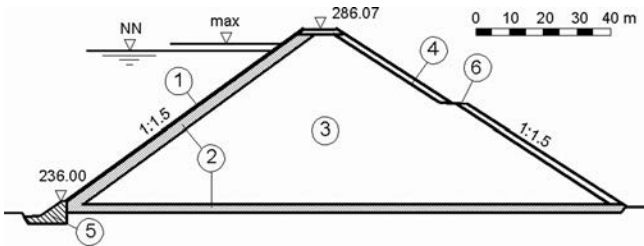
Martin Gonzalo dam, Spain (after Justo et al., 1988). (1) Facing with geomembrane; (2) load-bearing, i.e. drainage layer; (3) compacted crushed rock; (4) coarse rockfill; (5) concrete foundation; (6) berm.
